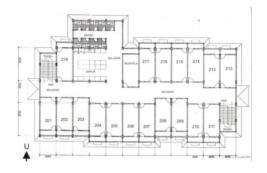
2, 3, 4 floor plan of Penjaringan Sari I Surabaya
